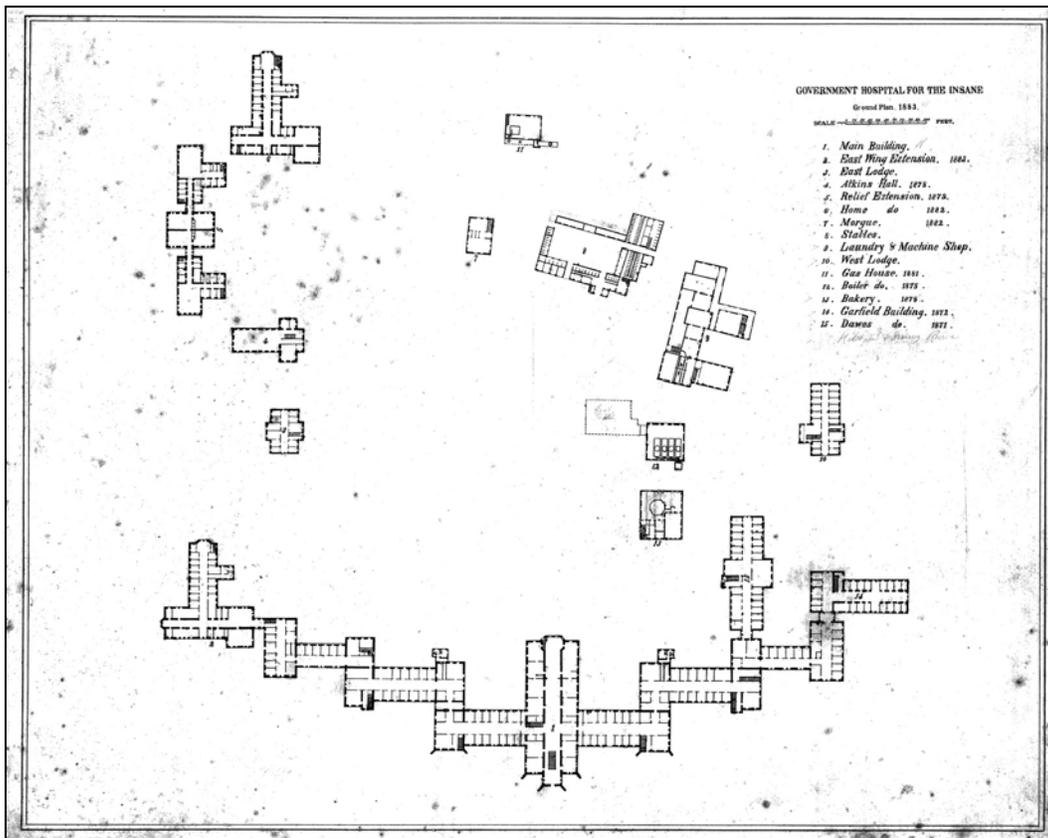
"Government Hospital for the Insane Ground Plan, 1883" depicts a series of service buildings constructed to the south of the Center Building as the hospital expanded and needed additional room for patients. Courtesy National Archives II.
